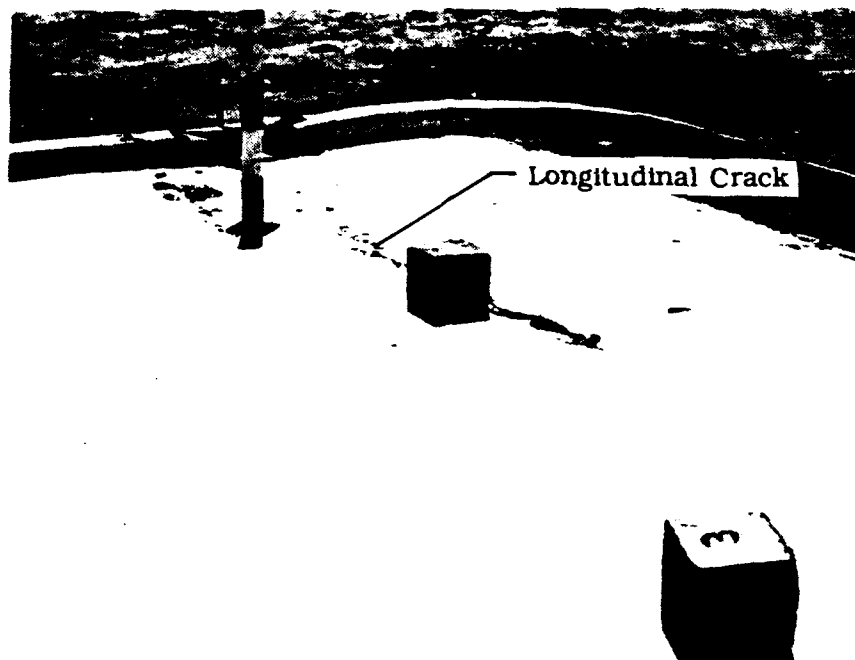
Longitudinal cracks at crown of arch, PAS-2.
